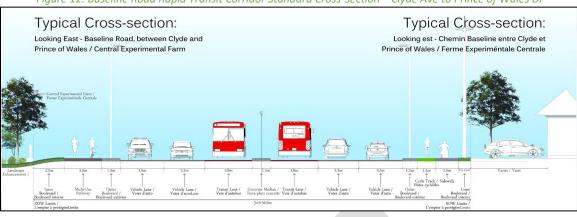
Baseline Road Rapid Transit Corridor Standard Cross-Section – Clyde Ave to Prince of Wales Dr
